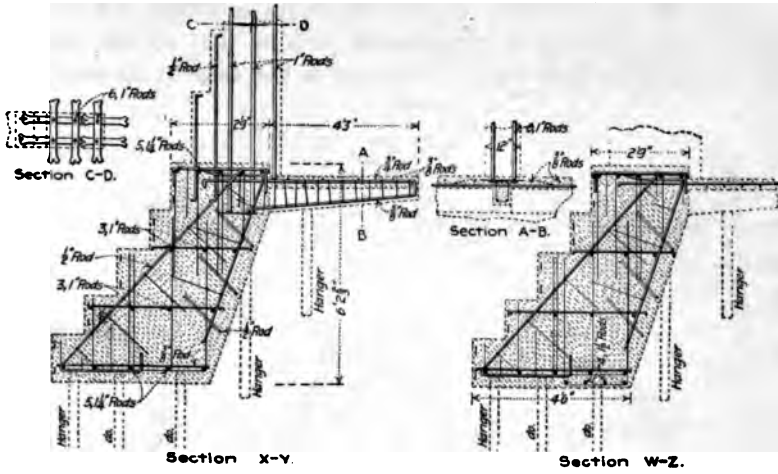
Details of Circular Girder, Naval Academy Chapel.
